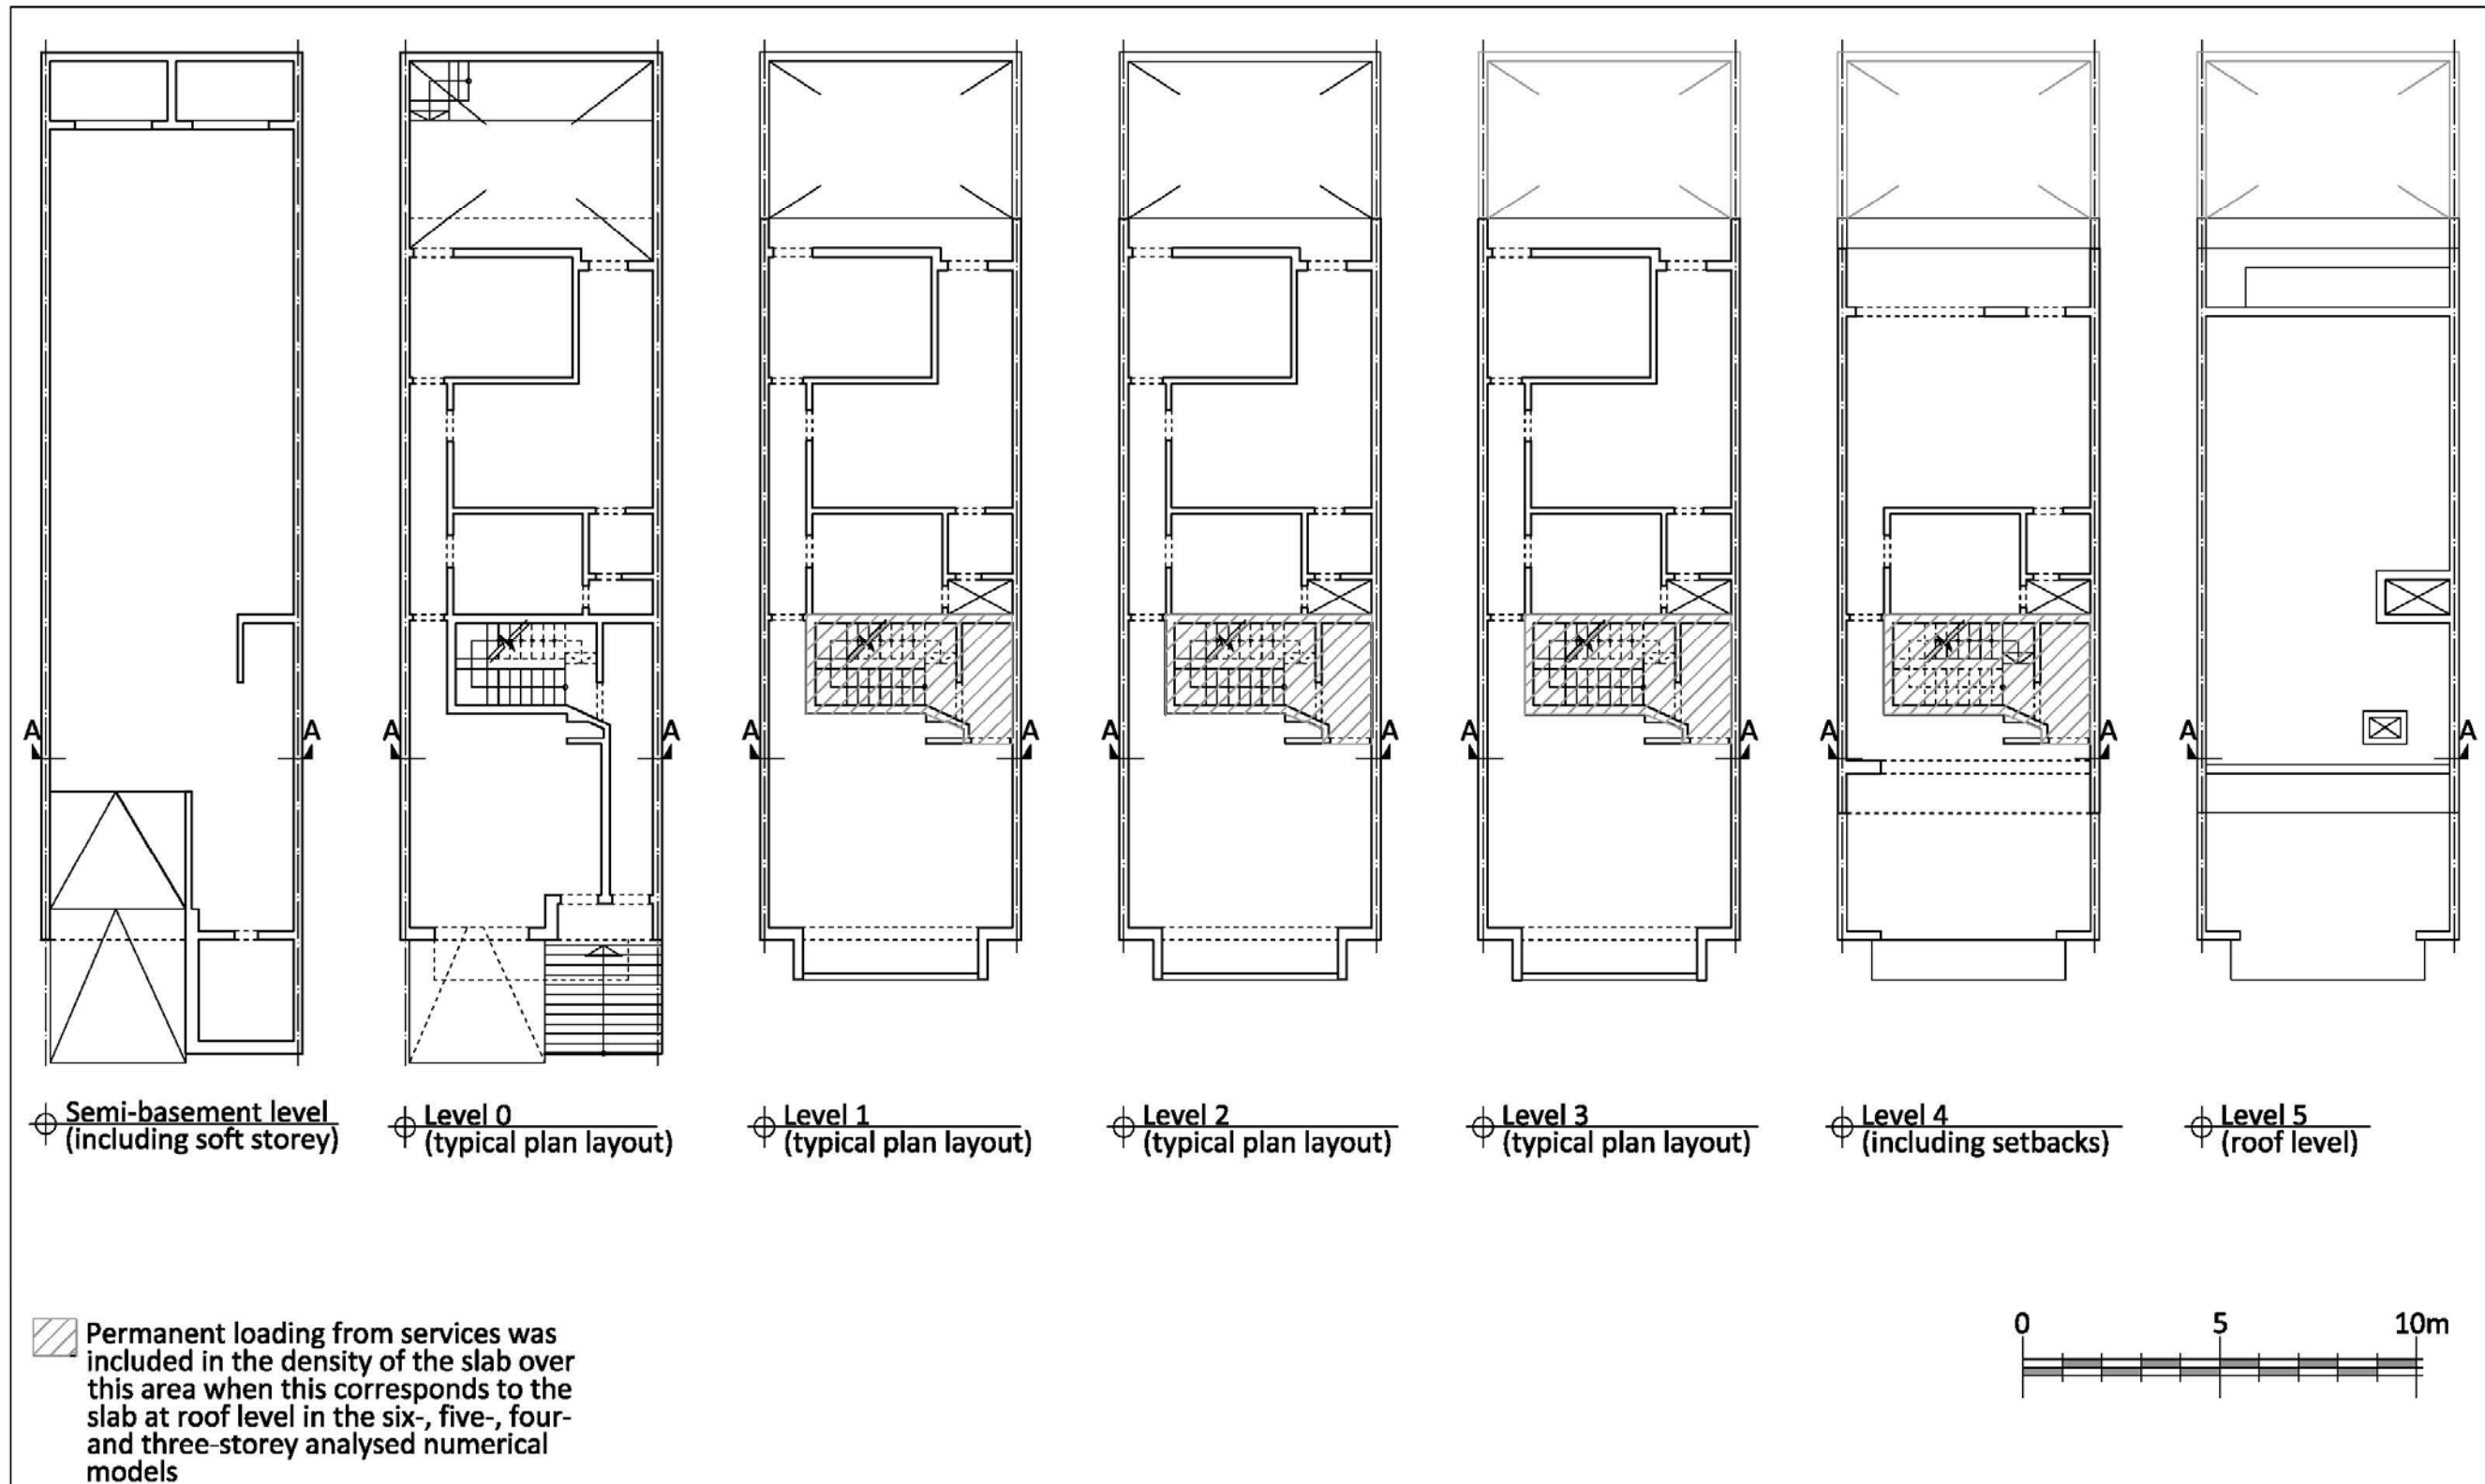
Plan layouts at all levels for analysed single building numerical models including a soft storey at semi-basement level and setbacks at penthouse level (plan length-to-width ratio 2.75:1).
